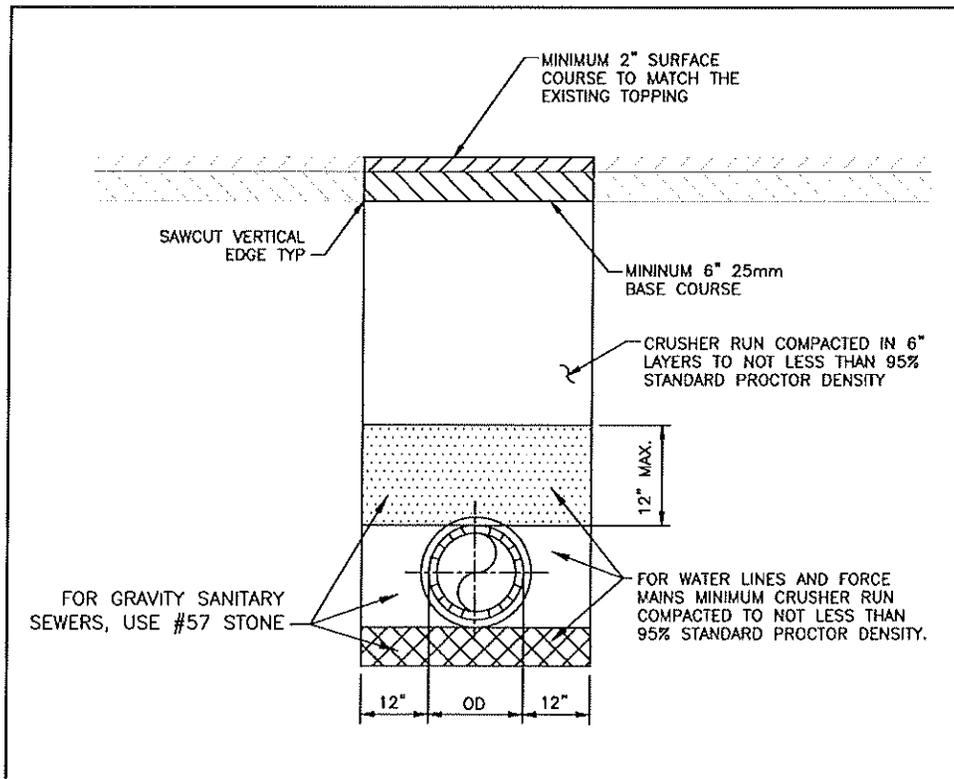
DeKalb County Standard Detail - Typical Asphalt Pavement Patch
